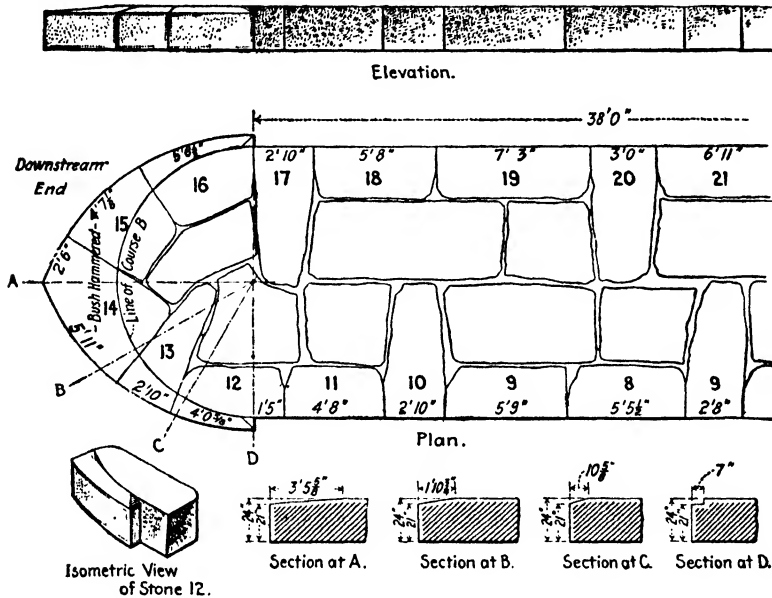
Starling Coping Course for Pier IV, Merchant's Bridge, St. Louis.
